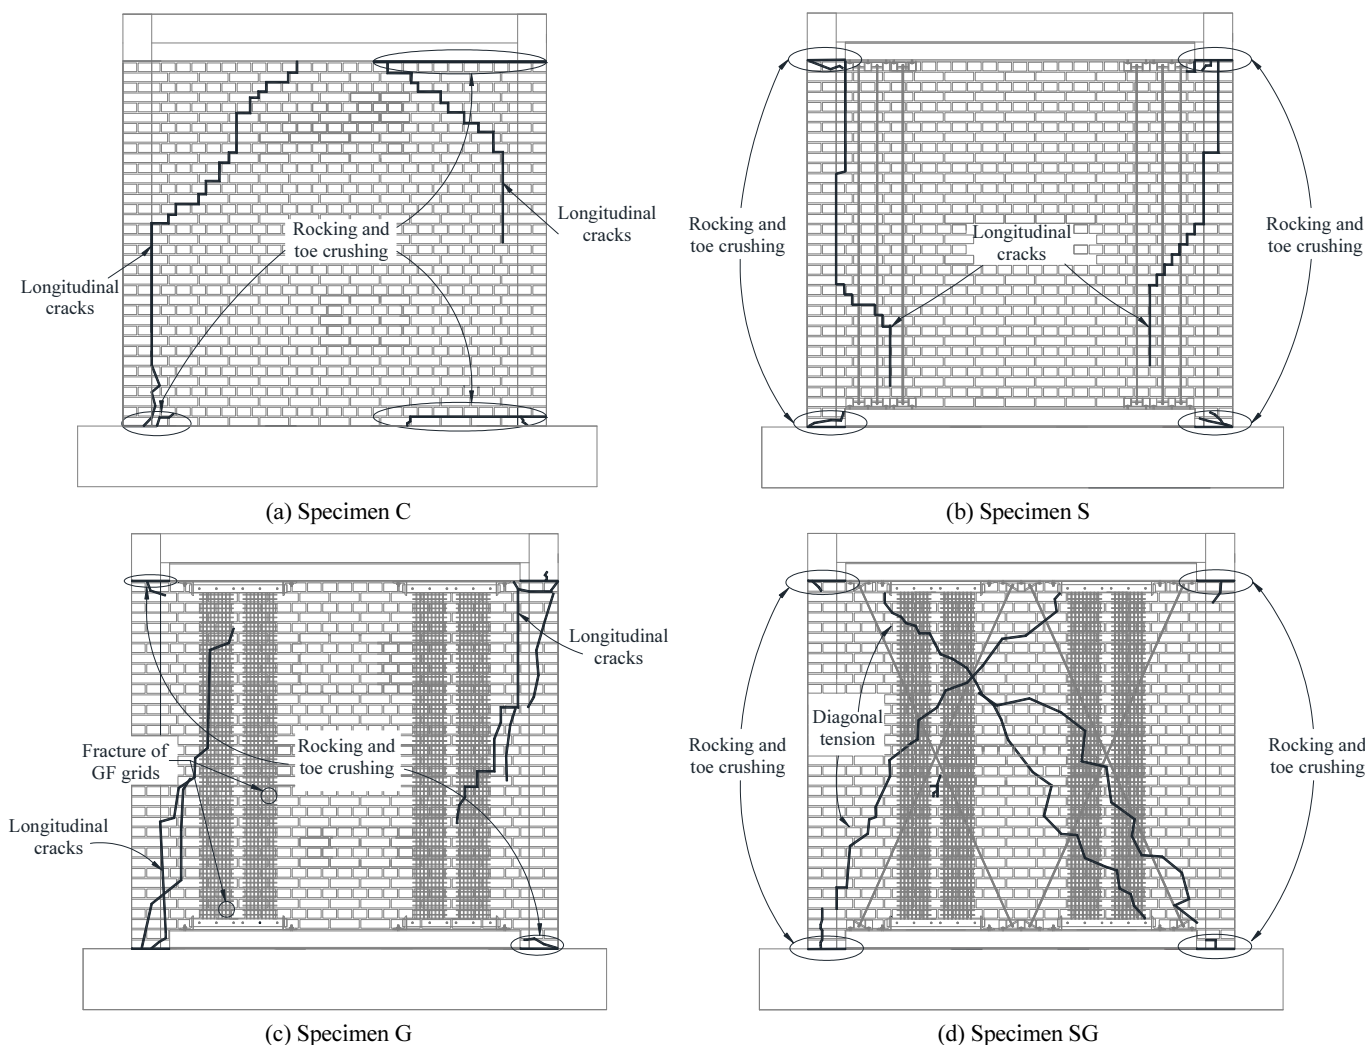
Crack propagations and failure mode of masonry wall specimens
